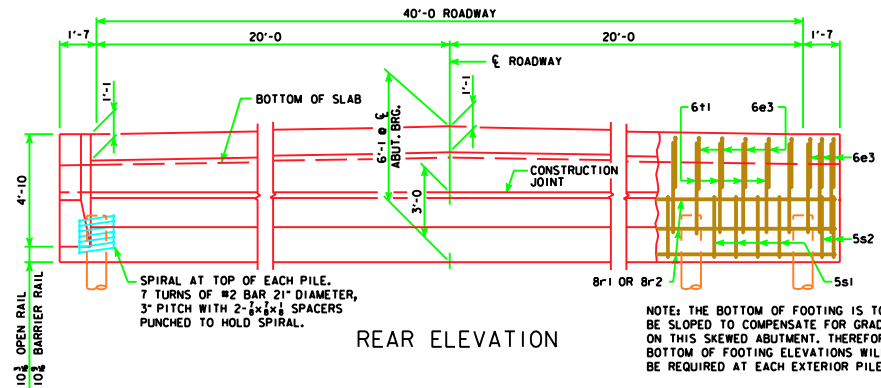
DETAILS ON THIS SHEET ARE TO BE USED ONLY WHEN ABUTMENTS ARE PLACED ON TIMBER PILES.
